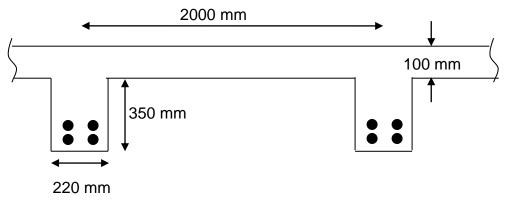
(not to scale) T-Beam-and-slab cross-section
